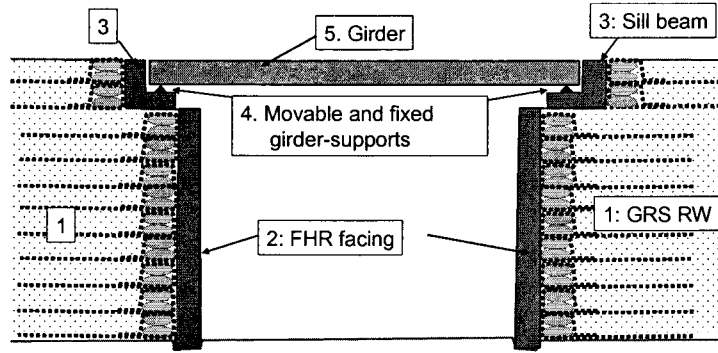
FHR facing as a continuous beam supported at many places with a small span.
